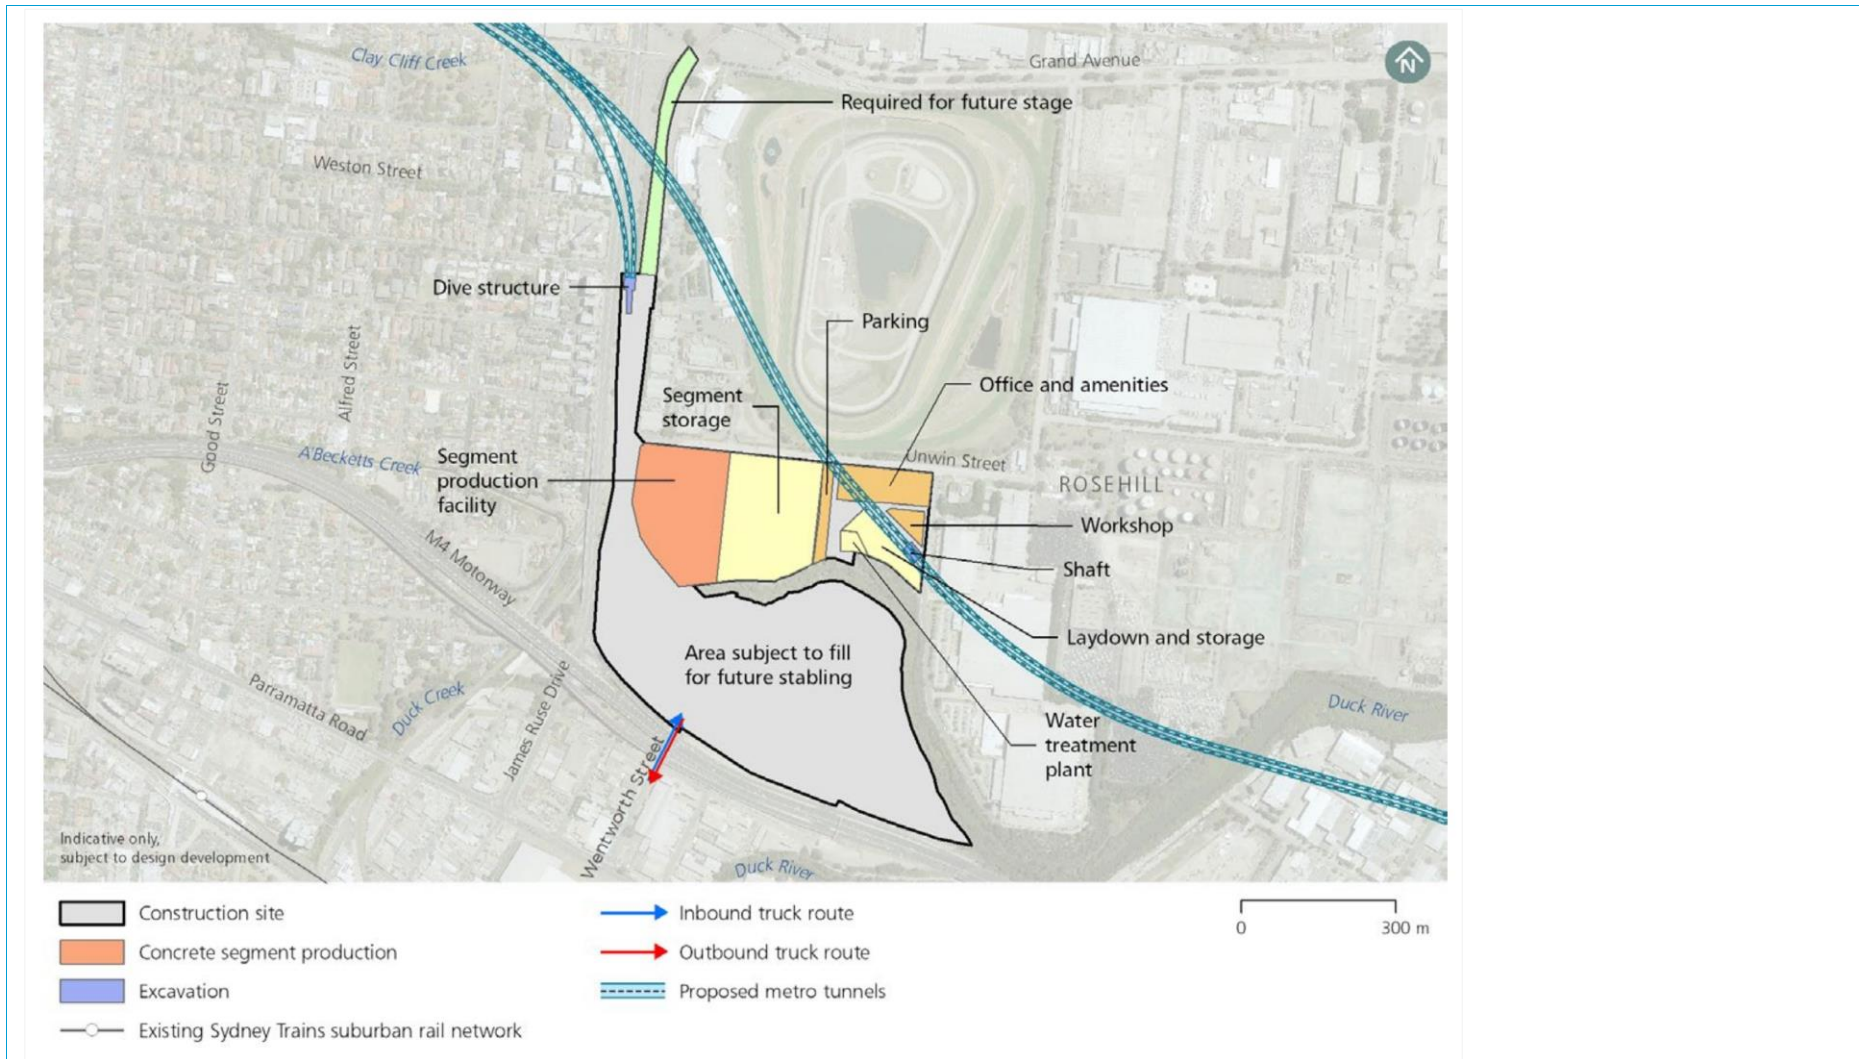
Clyde Stabling and Maintenance Facility Construction Site (Source, EIS Figure 9-17)
